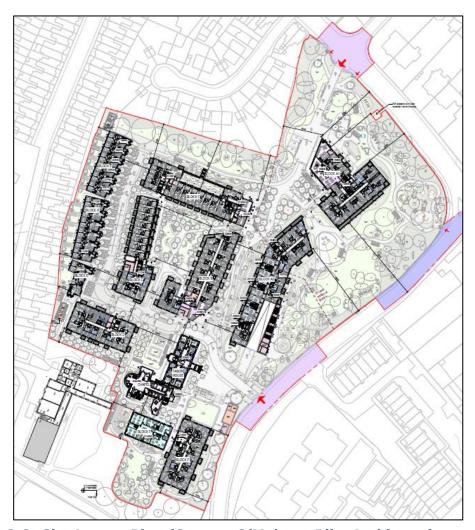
Site Layout Plan (Source: O'Mahony Pike Architects)
